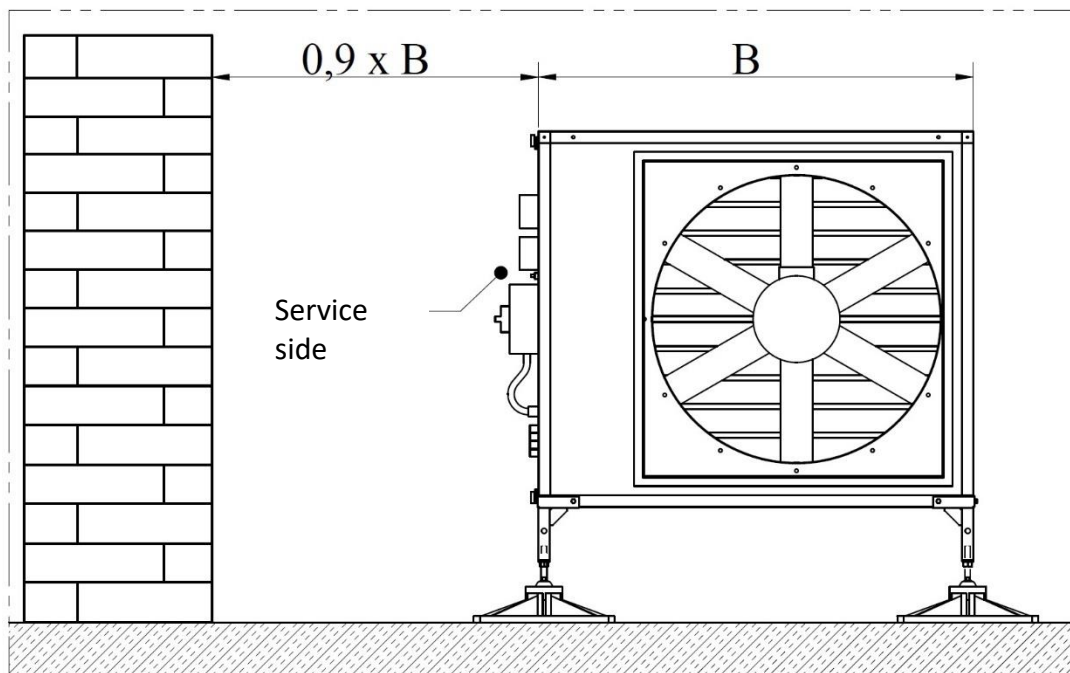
Minimum distance between iSWAY-FC® units and fixed installation elements.
